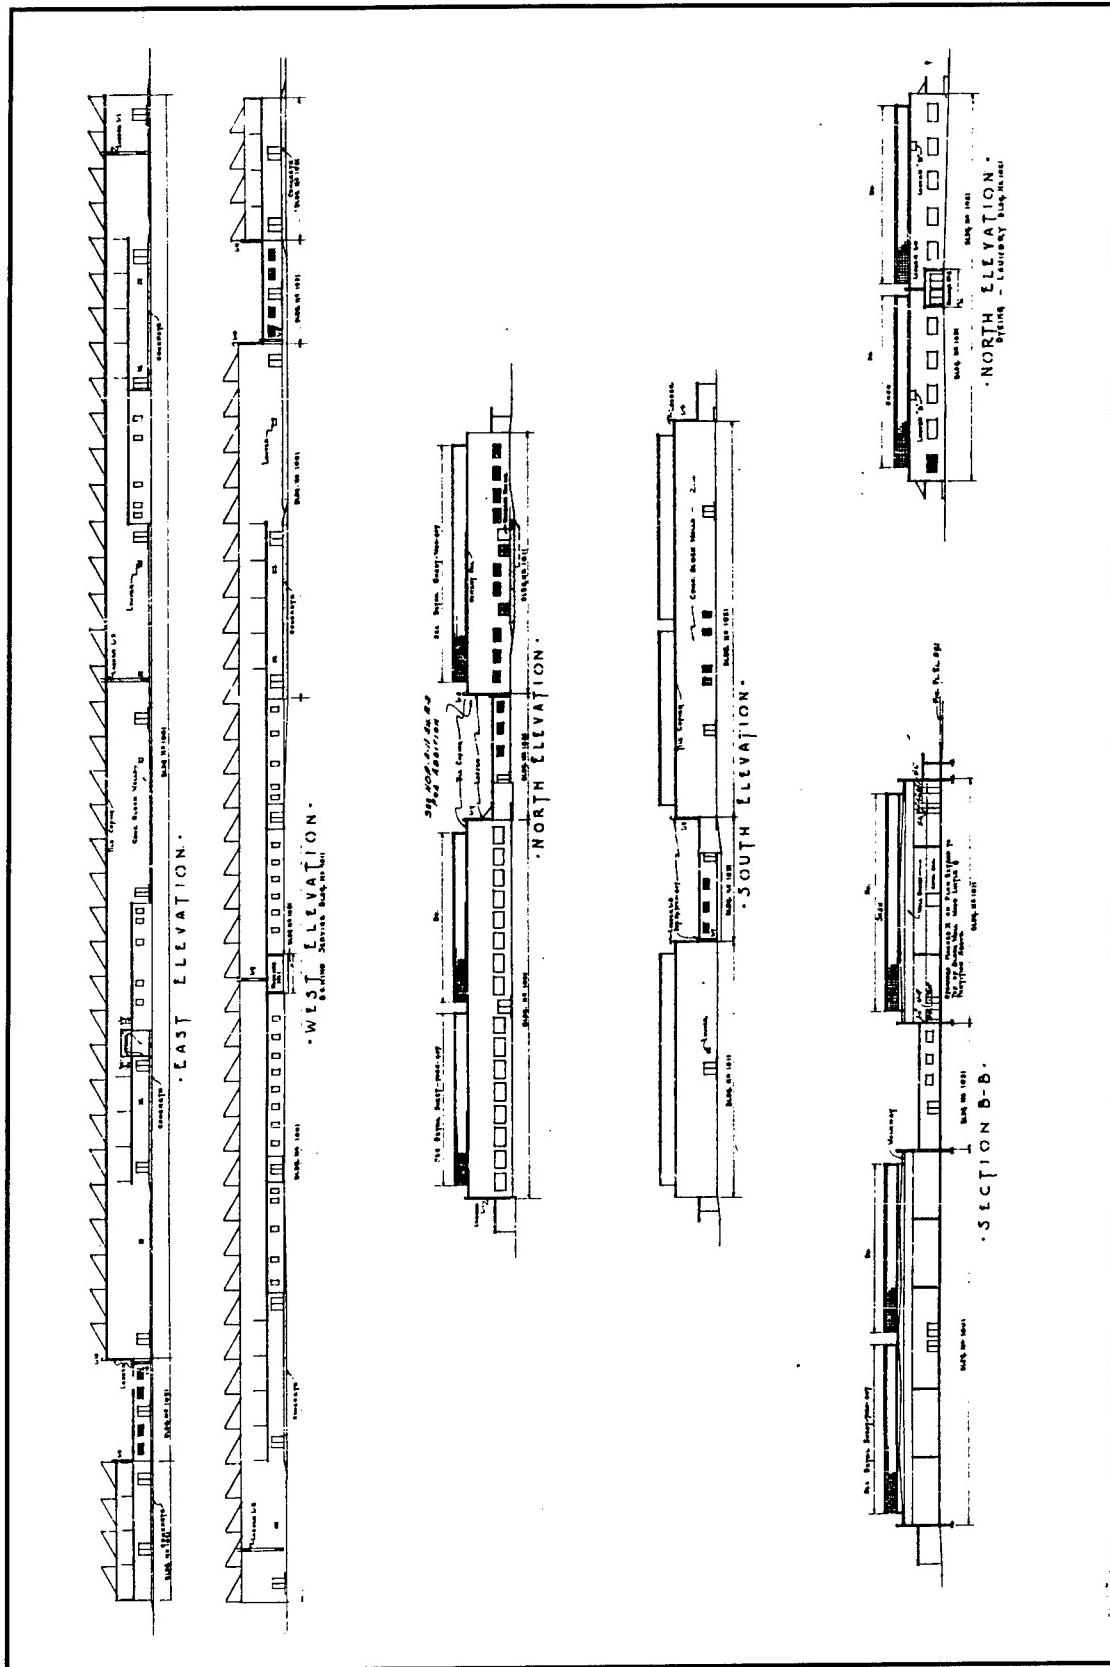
The bag manufacturing building group (buildings 1001, 1011, 1021, and 1031), Hoosier Ordnance Plant (INAAP Drawing 7020-402).
